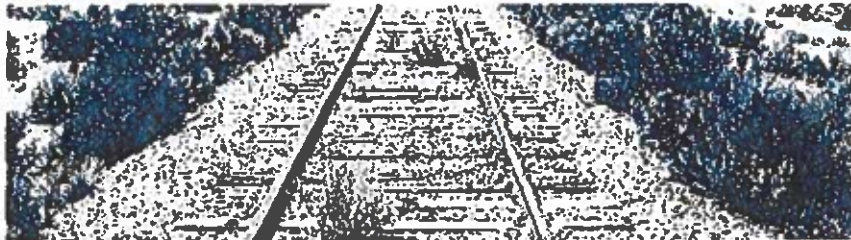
Typical Rail Bed Cross Section from MP 18.5 to MP 61
